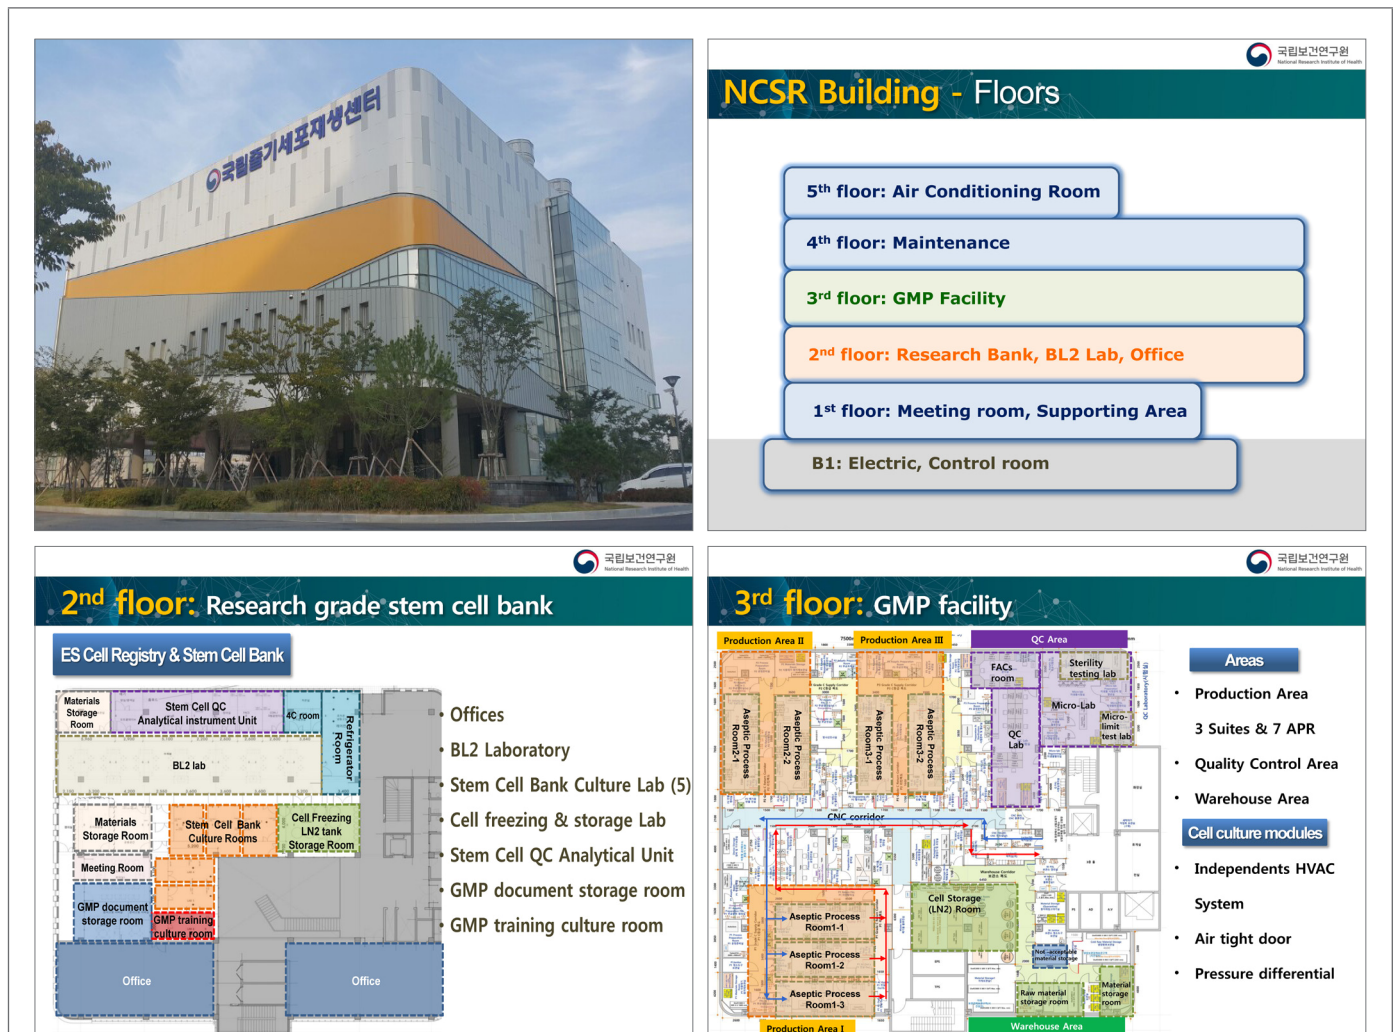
The exterior and floor plans of NCSR(National center for stem cell and regenerative medicine) building
